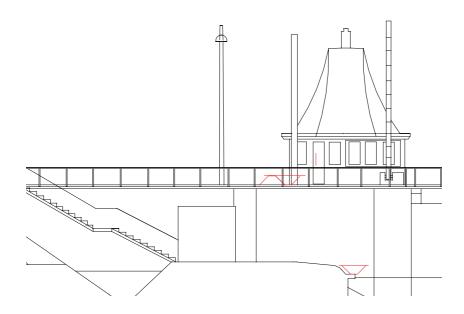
Side view of the bridge house of the Reineveldbrug and it's significant surrounding. Image by author.
